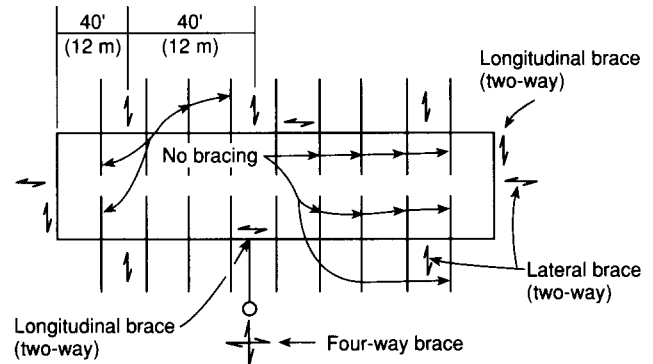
(d) Typical location of bracing on a looped system.
